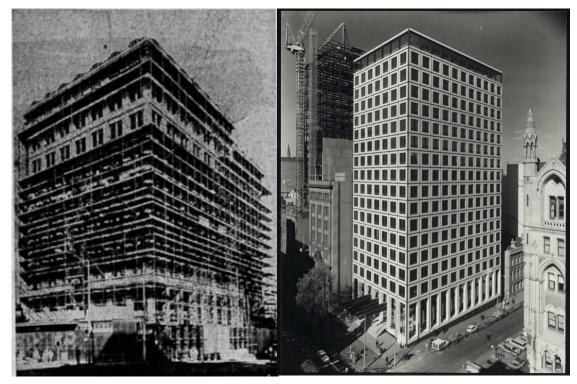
New Legal & General House under construction, 1966. (Source: *Age* 25 October 1966:13)
